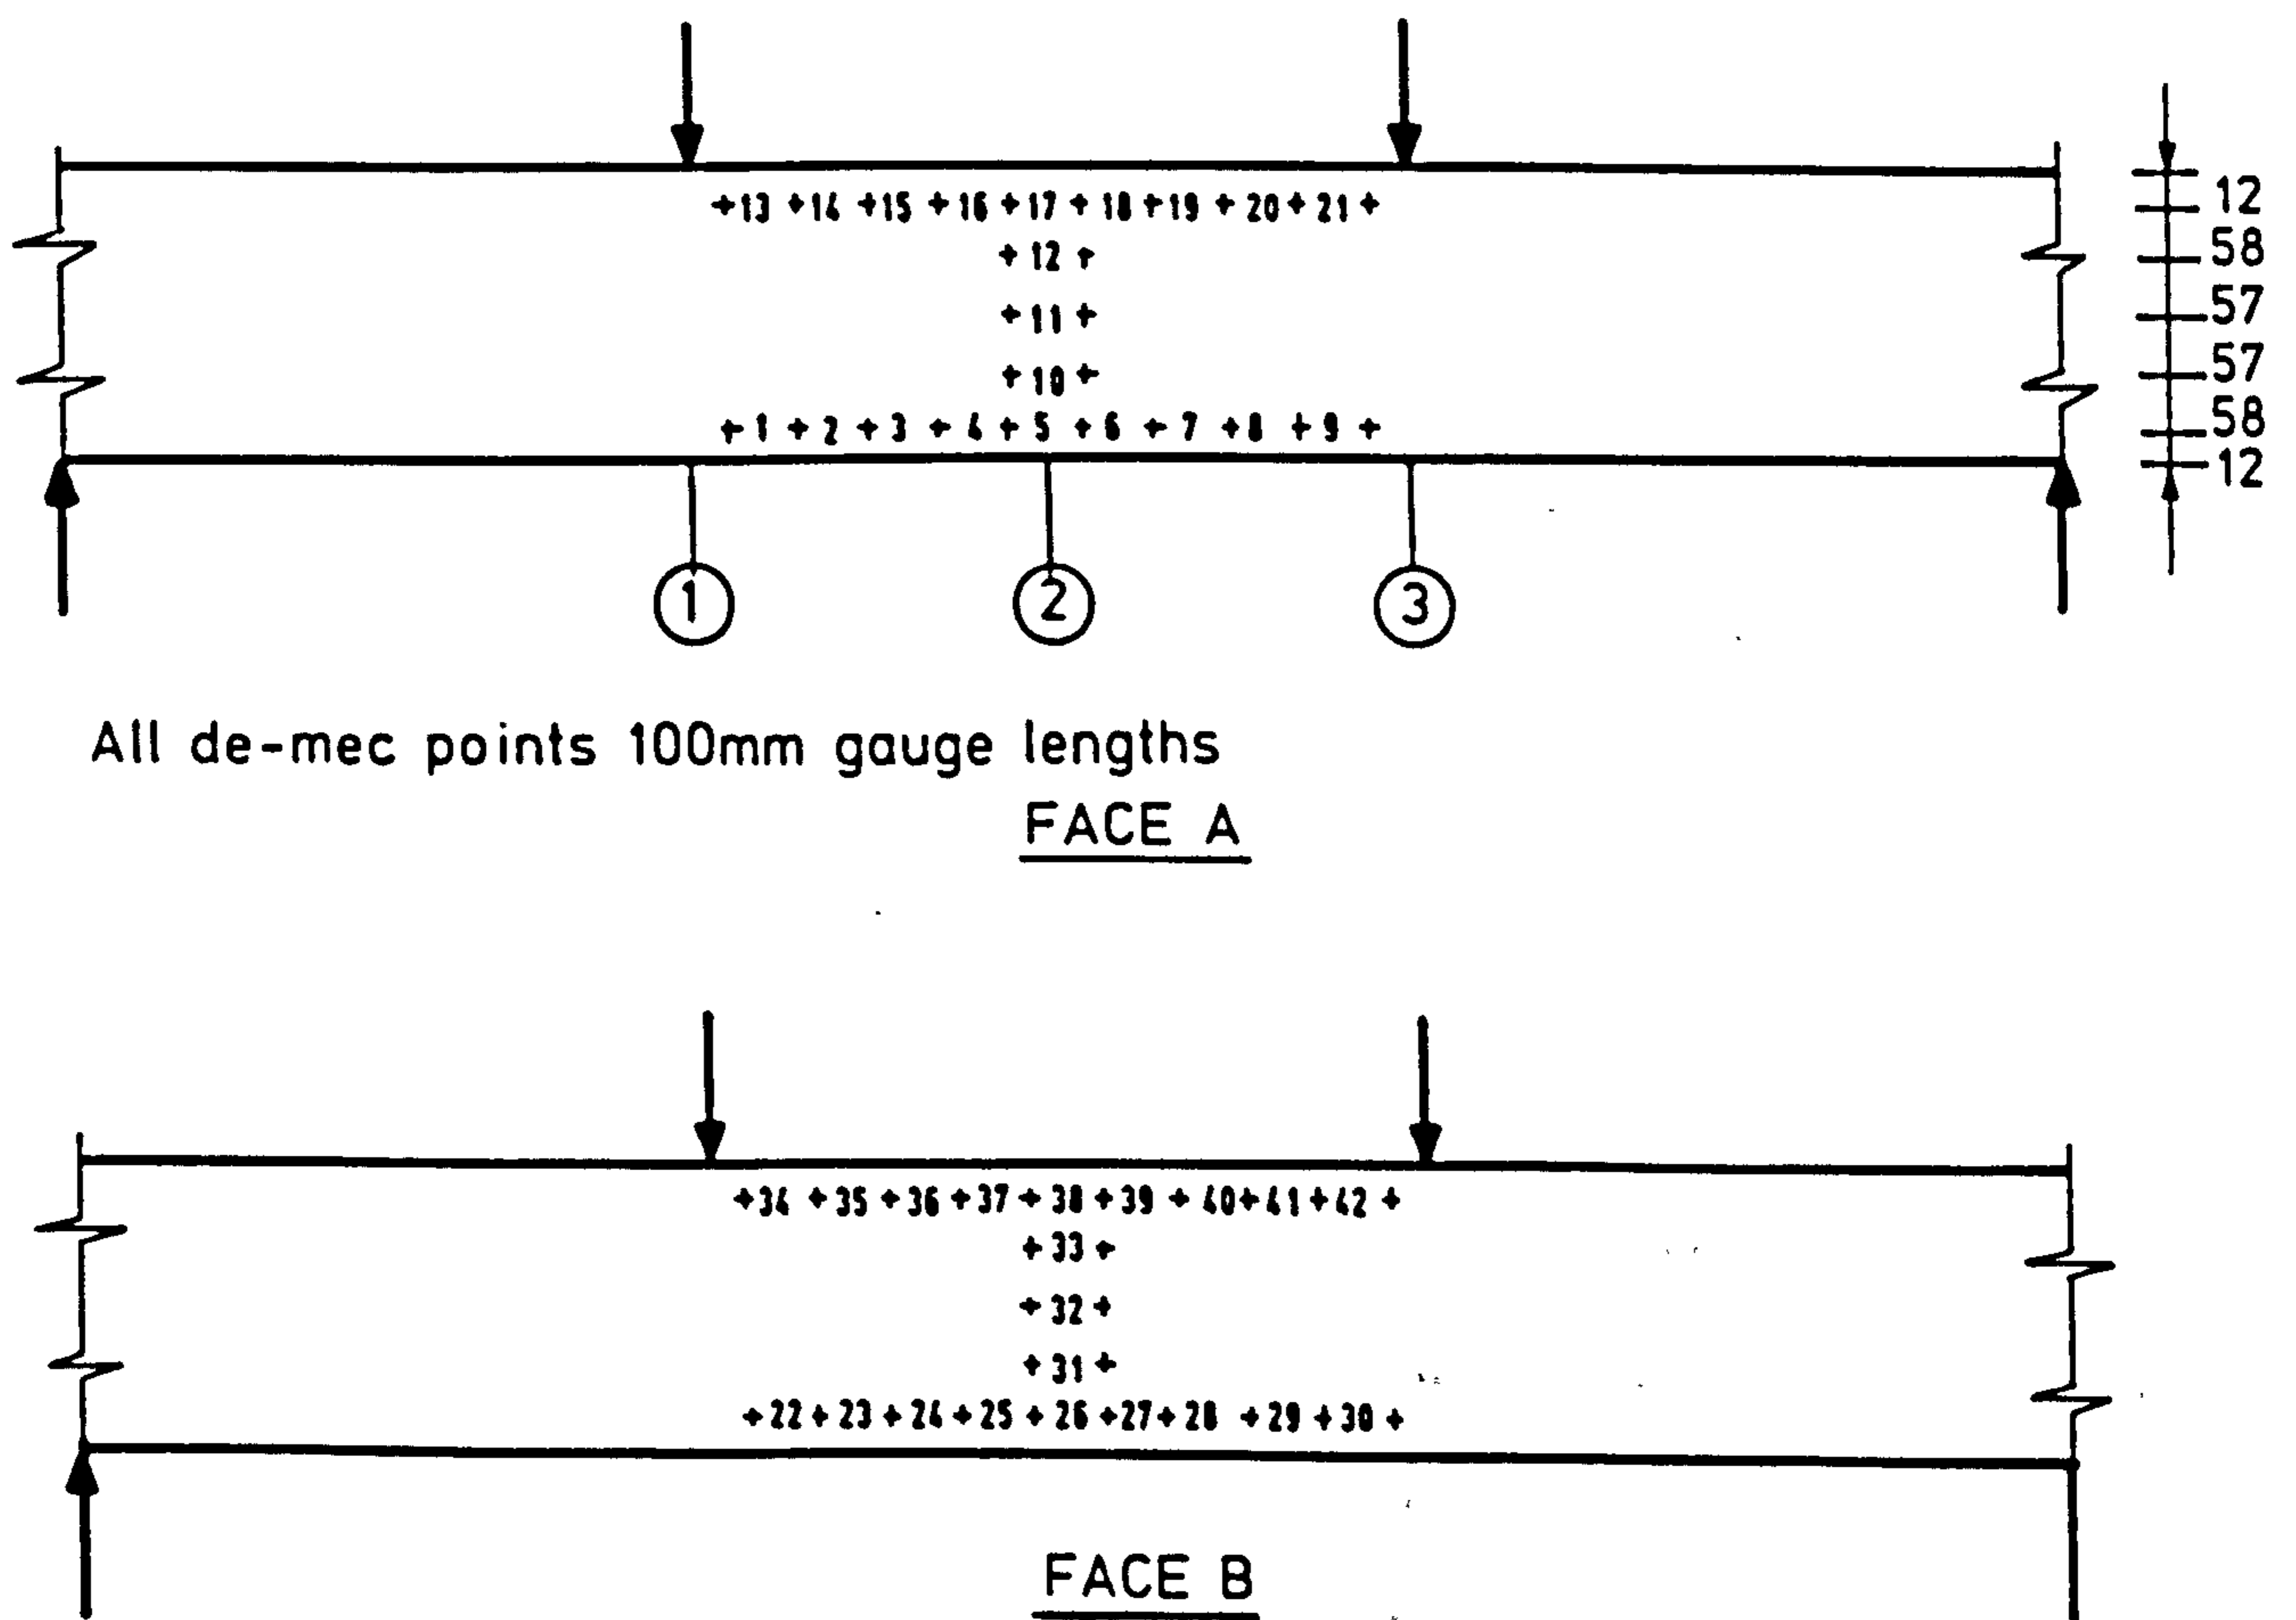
TRANSDUCER AND DE-MEC POINT LOCATIONS FOR MODEL 2 LONGITUDINAL SECTIONS
